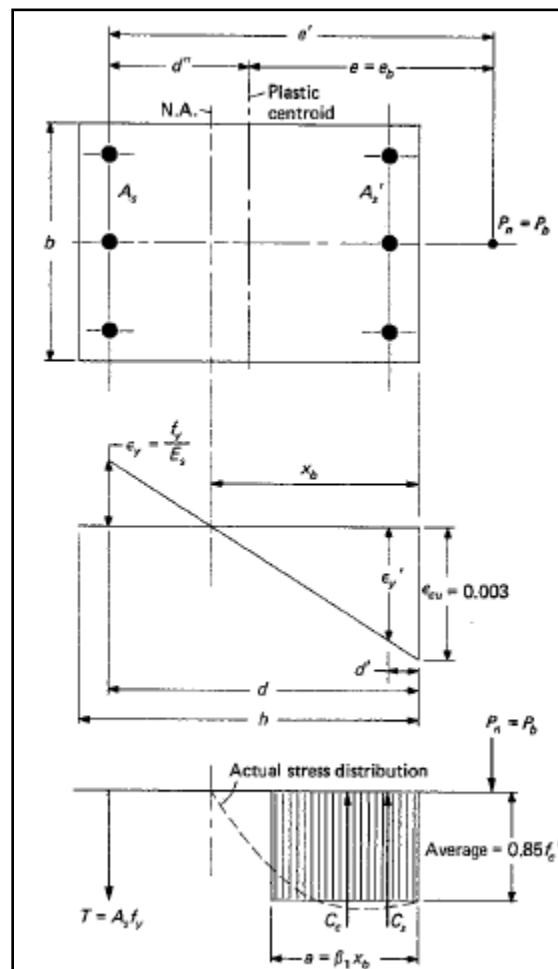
Column Cross Section with Strain and Forces (Wang et al 2007, 447)
